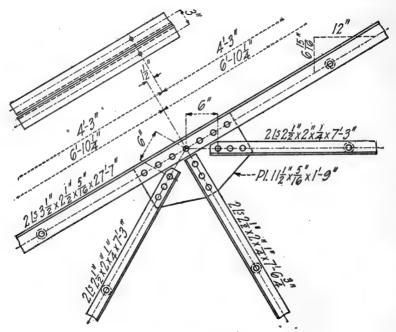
TRUSS JOINT, SKETCH DETAILED.
